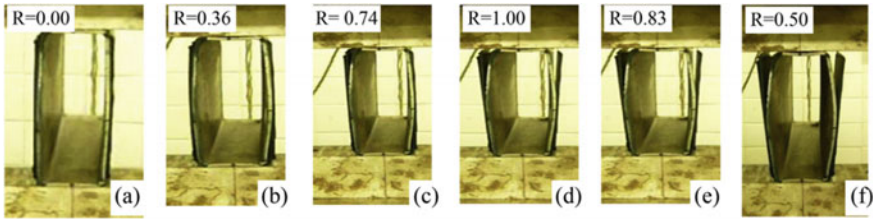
Tested progressive failure of adhesive bonded CFRP-strengthened steel sections
